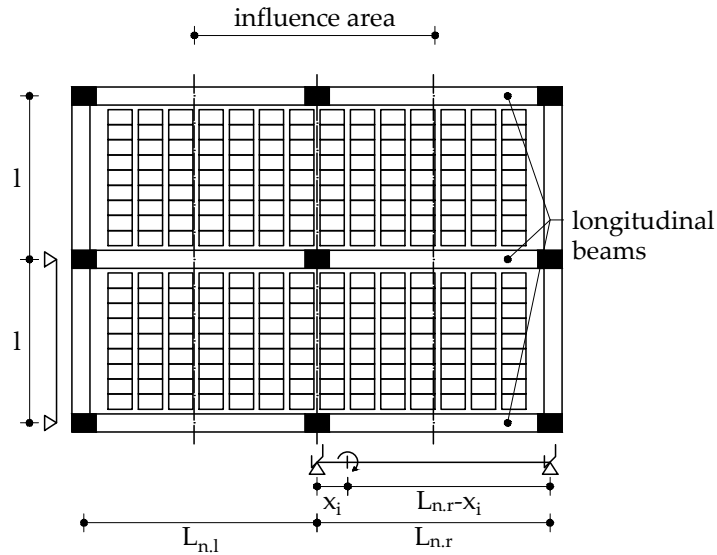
Carpentry plan of a building designed for gravity loads.
